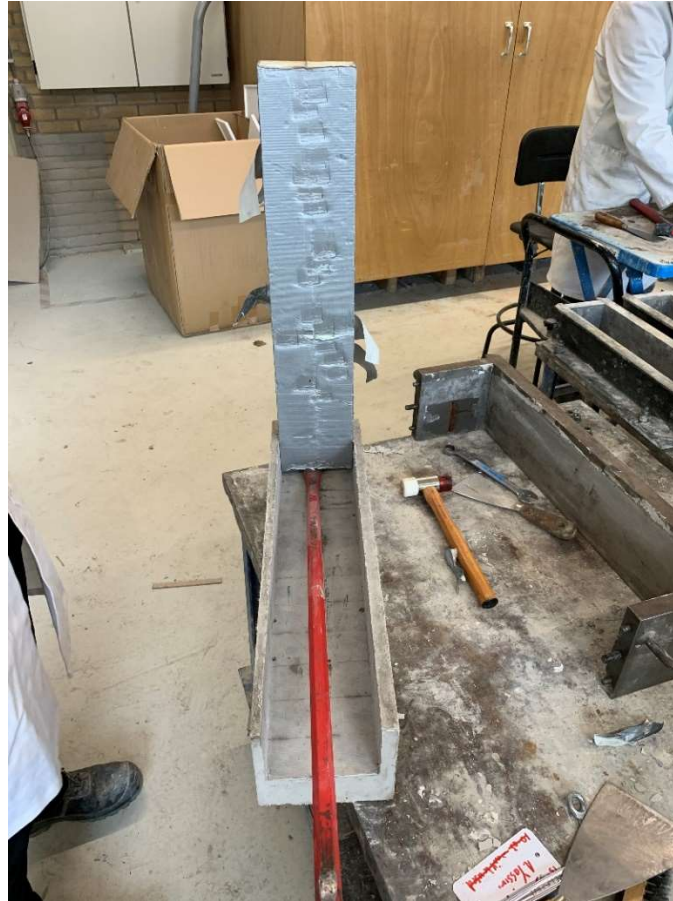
inside and outside moulds for casting a U-shaped mould
